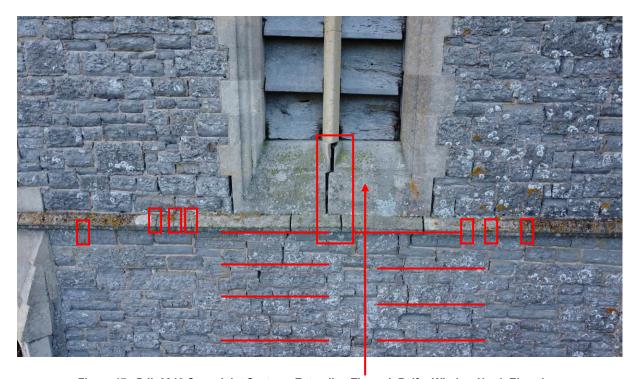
DJI_0246 Open Joint Systems Extending Through Belfry Window North Elevation
